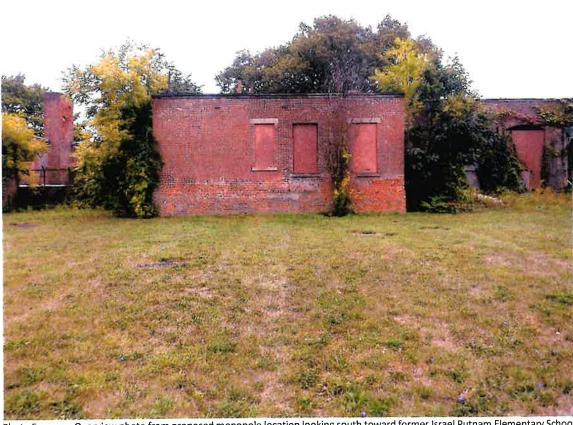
Overview photo from proposed monopole location looking south toward former Israel Putnam Elementary School in New Britain, Connecticut.
